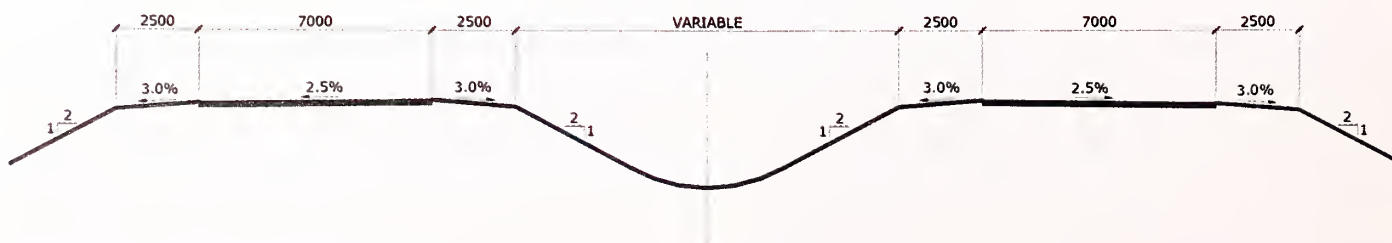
Typical One-Way Camber in Super Elevated Sections
